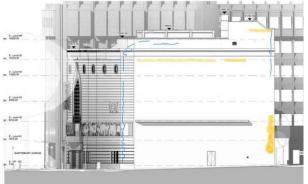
New Compton Street elevation. Cracking brick replacement is shown by orange shading
